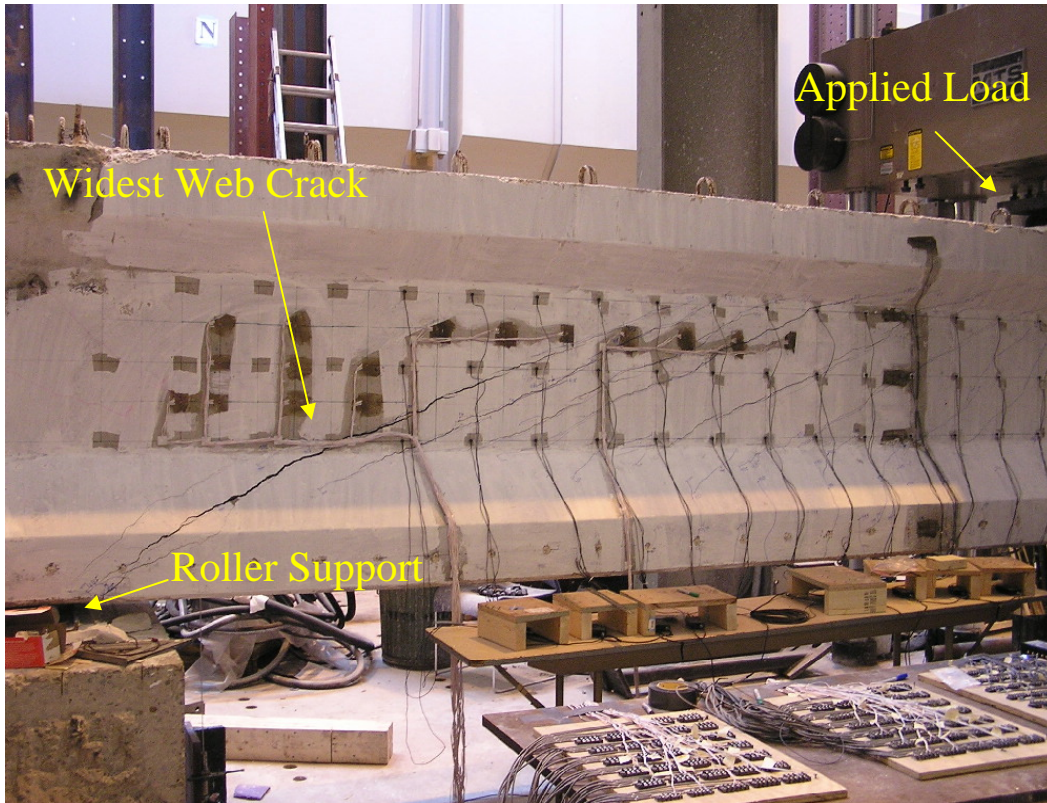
Photograph of Cracking at Peak Load (Specimen II)
